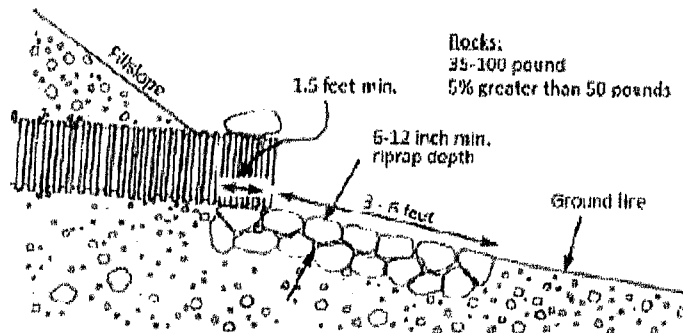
A. Riprap armor at culvert outlet (Modified from: Keller et al., 2011).
